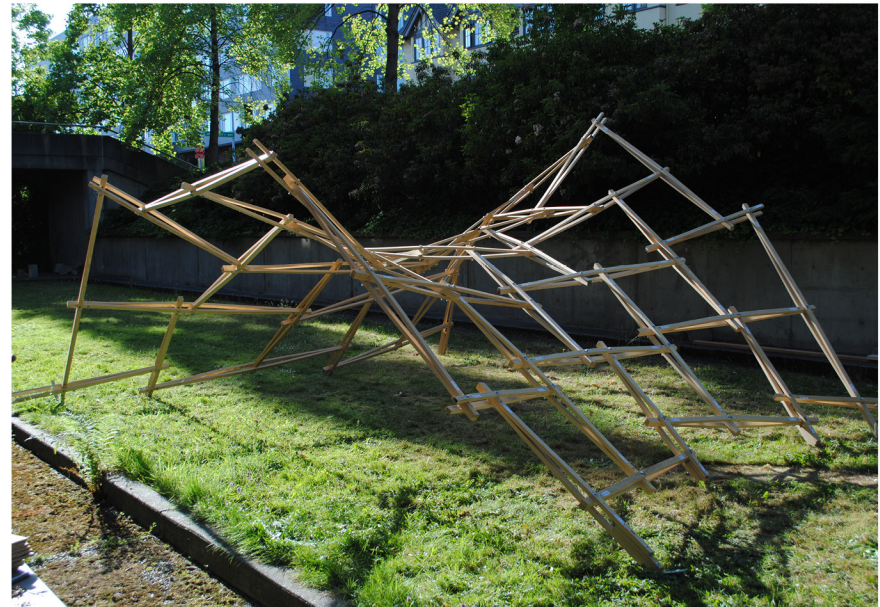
Disassembly provided further insight into the structural requirements of the assembly. Releasing the south footing plate from the lawn, the structure did not appear to be placing significant compression or uplift on the footing. The plate could be moved, but the structure resisted this action. After releasing the north plates from the wall, the entire structure was lifted from its footings and placed on the lawn. As the scale model had done, the frame maintained its form to a great degree. Rotational resistance provided by the interleaved joints prevented the grid from twisting significantly as the model had done. When the outer edge members were removed, the grid was able to lie almost completely flat. This suggests that compression in the border of the frame was largely responsible for its form.
